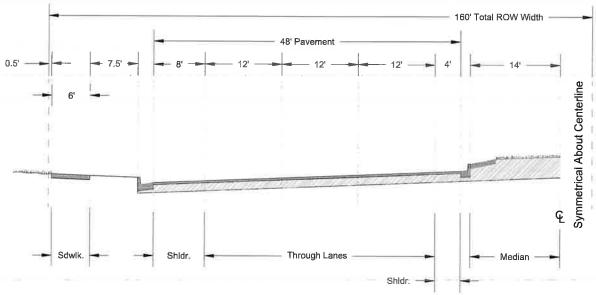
Typical Urban Expressway Cross Section (4 Lane)
